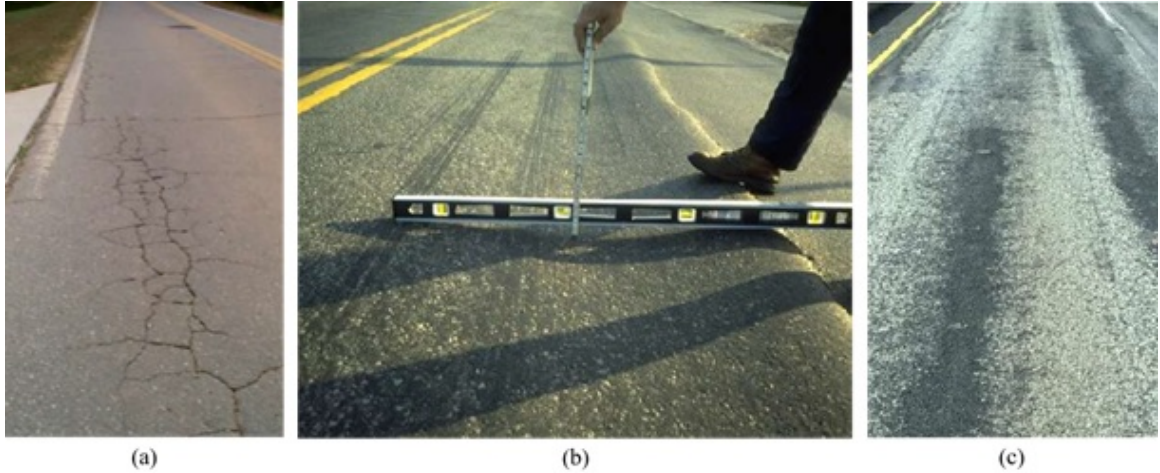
(a) cracking, (b) rutting and (c) raveling on asphalt pavements (GDOT, 2007)
